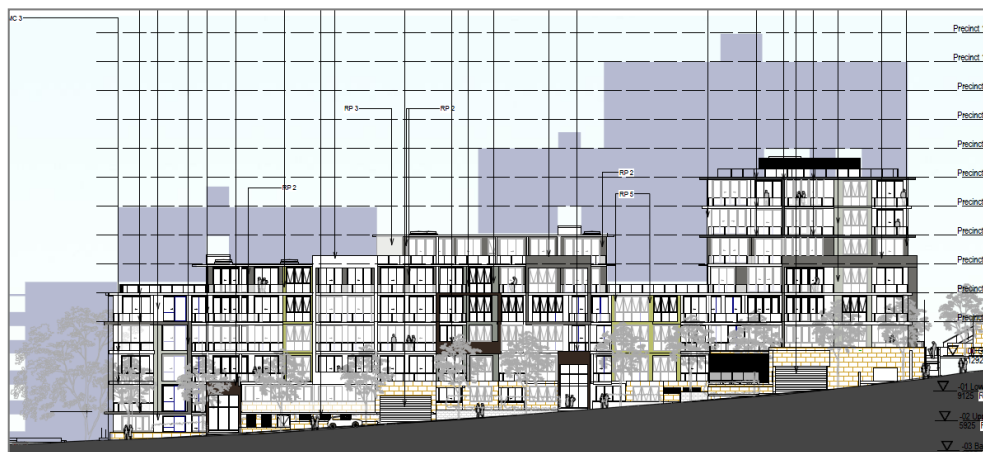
Extract of the Proposed Belmore Street Elevation Plan showing the improved relationship of the dwellings and their connection with the public domain at street level.
